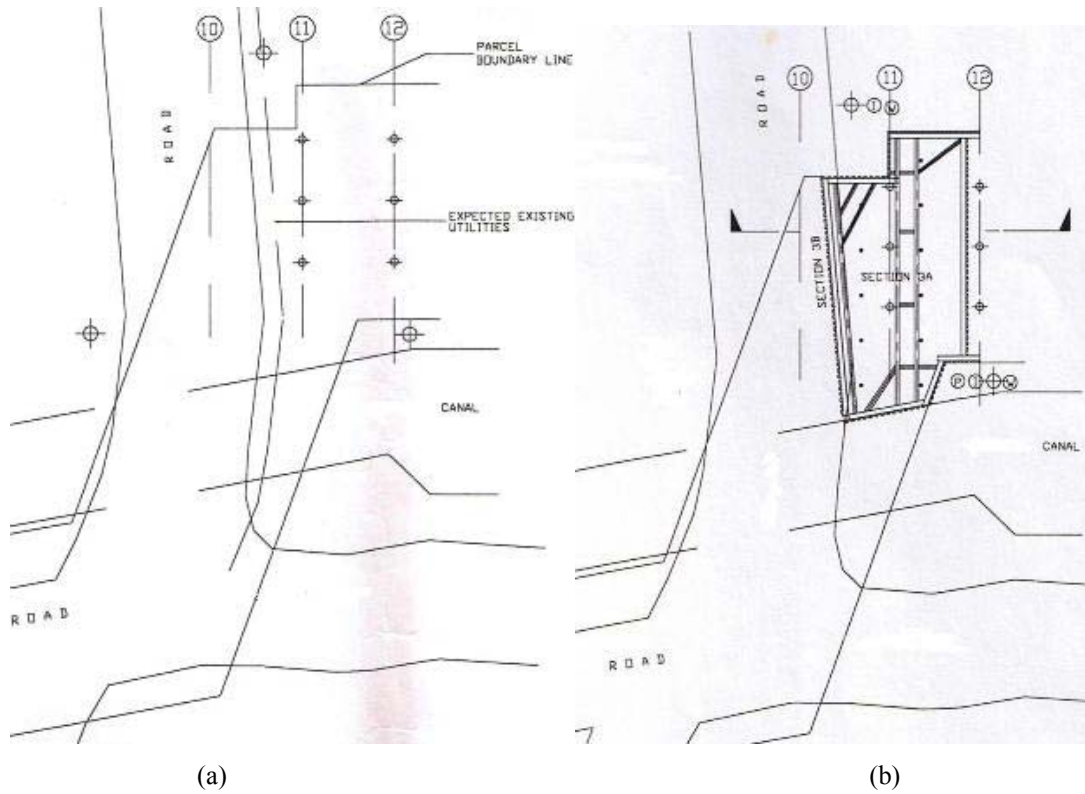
(a) Existing features and land parcel line; (b) planned excavation steelwork (first phase)
